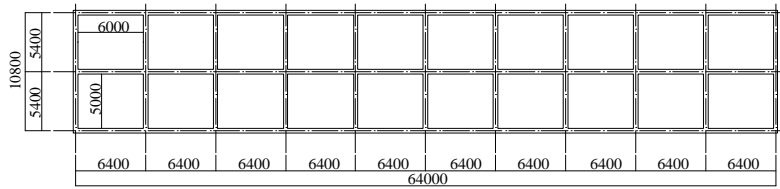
Plane view of the underground pit of the apartment housing (non-scale)
